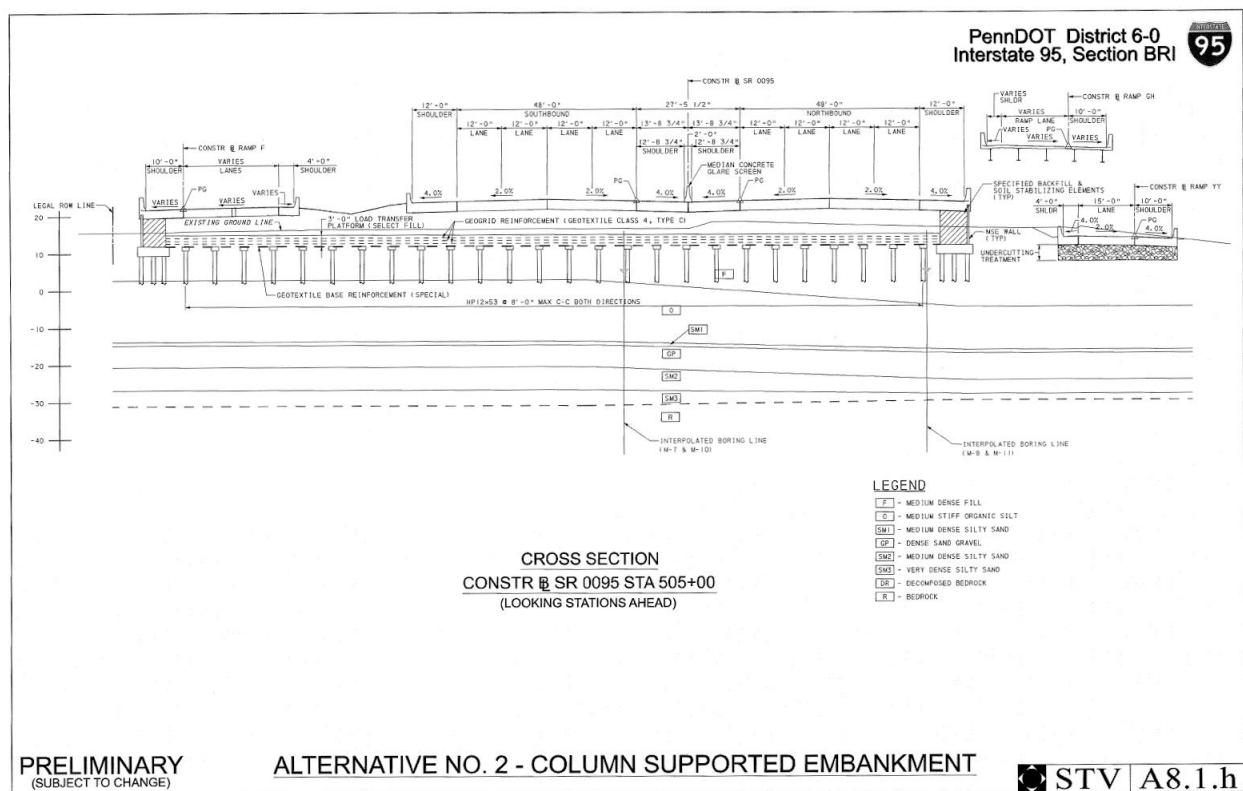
Example cross section at Station 505+00 for the Section BRI column supported embankment design alternative.
